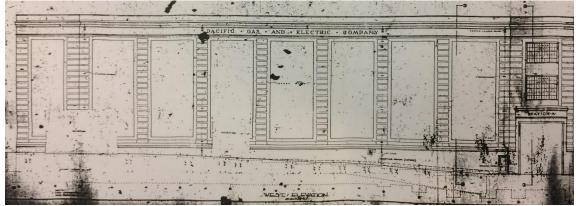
West elevation of Station A Switching Center (1930). Drawings by the PG&E Department of Engineering. Source: San Francisco Planning Department.
